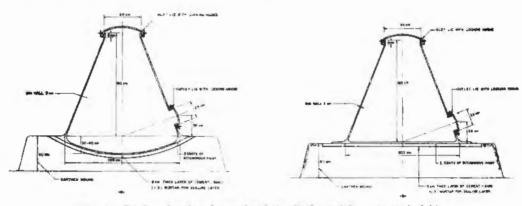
Section showing demensional details for a 2.0 tonne conical bin, (a) Saucer shaped base, (b) Flat base.
